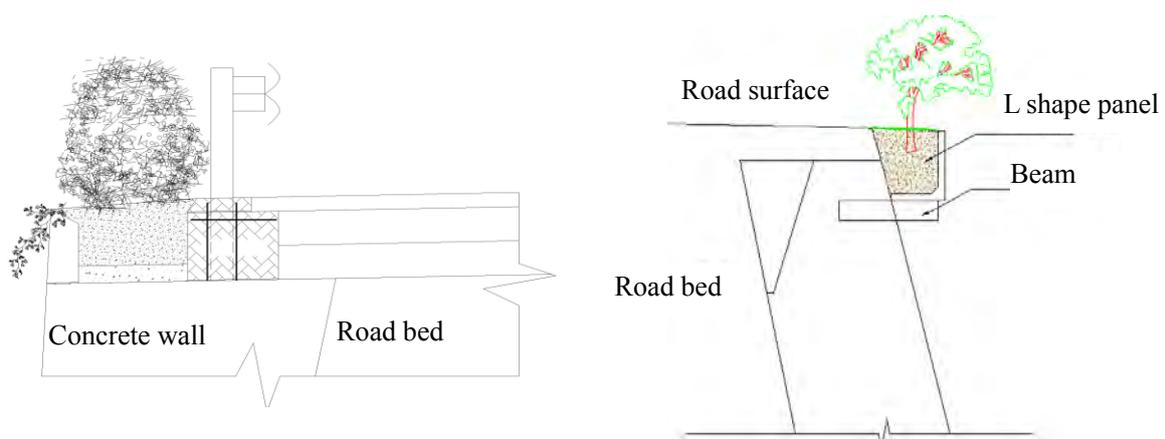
Grooving in the roadbed (left)and overhang groove (right) for plantation
